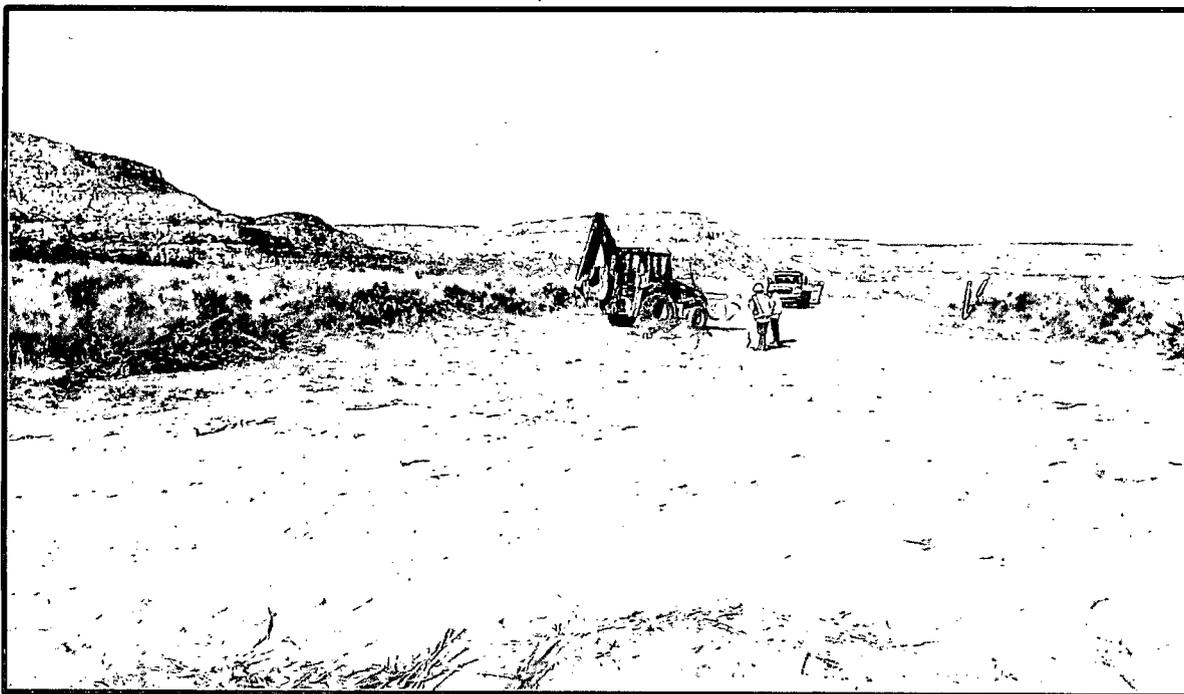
The Trunk K #7 release site being prepared for excavation activities.
